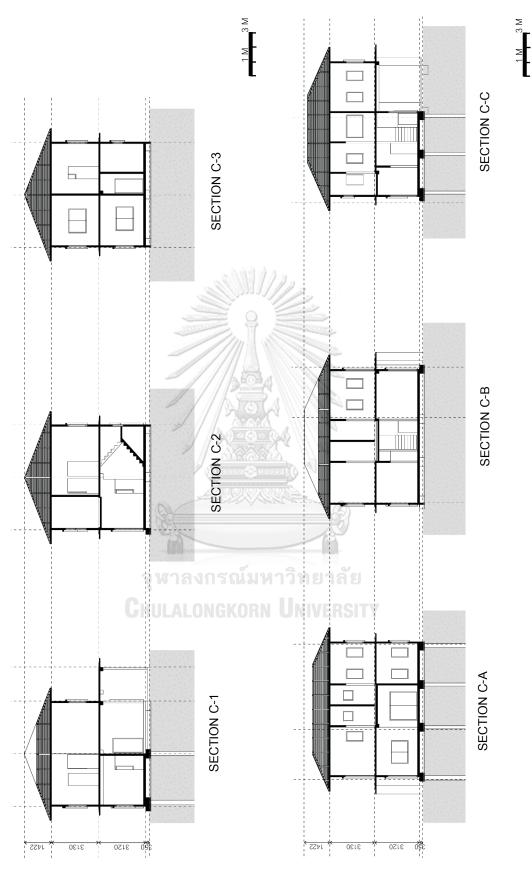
Drawing of front section cut of A3 unit at section C-1, section C-2, section C-3 and a side section cut of A3 unit at section C-A, section C-B and section C-C
